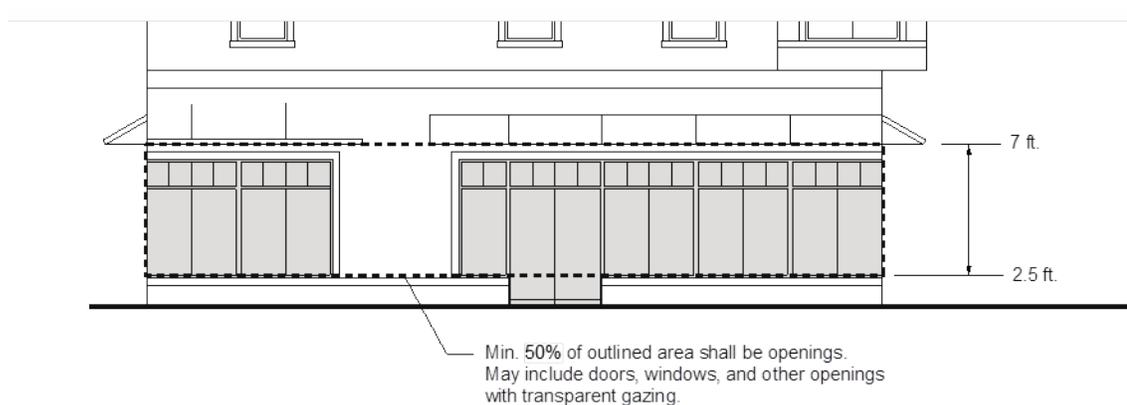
B.4.B: GROUND FLOOR COMMERCIAL TRANSPARENCY
